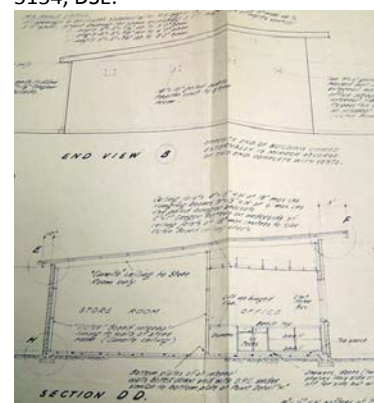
Side elevation and section drawing of proposed Administration Building, 1 August 1965. Source: Crown Land file Rs 5154, DSE.
